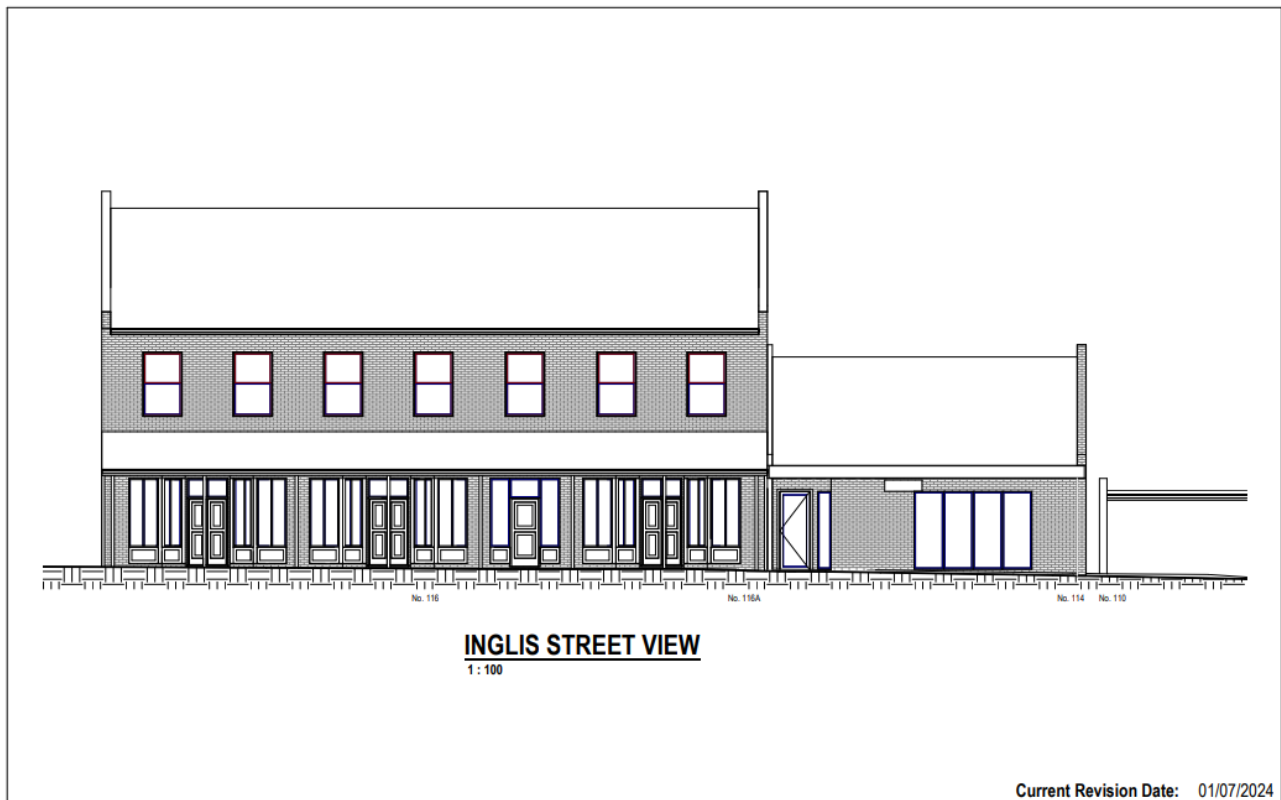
Streetscape view with the subject building to the right and 116 Inglis Street to left
